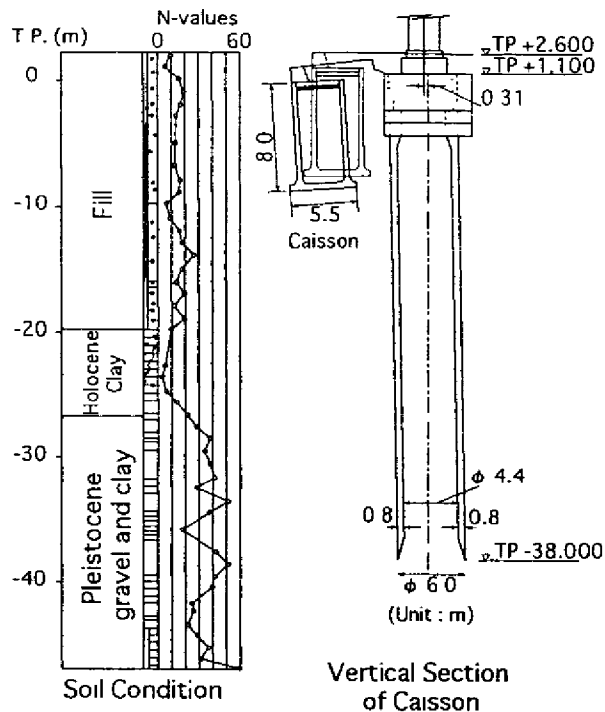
Profile of caisson foundation and soil in neighborhood (Rokko Liner) ¹⁹⁾
